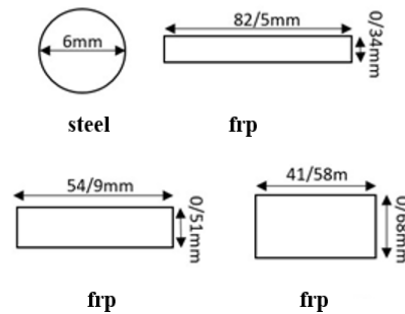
Schematic Cross-Sections of Modeled Stirrups (Not to Scale)
